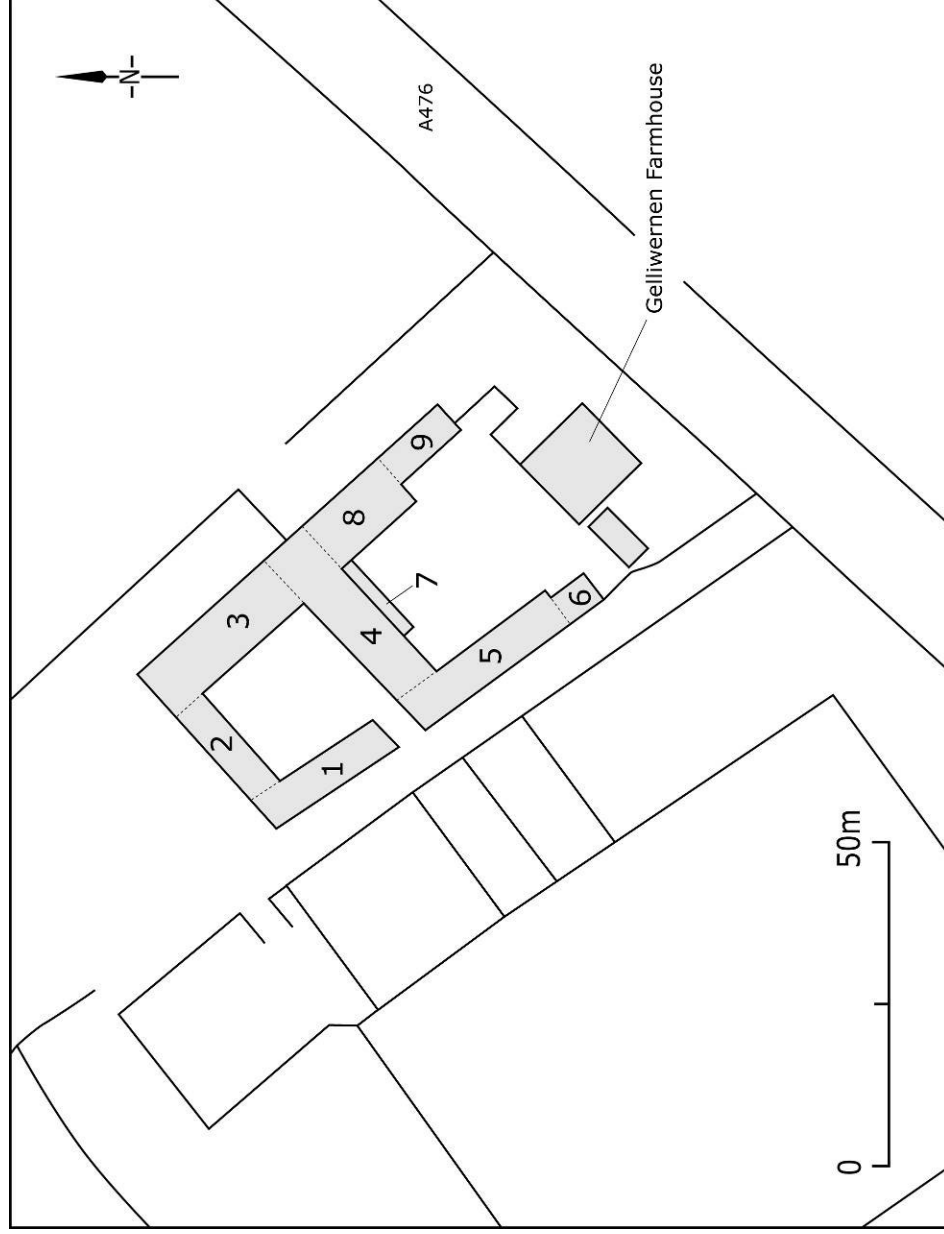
Plan of Gelliwernen showing building locations with numbers referred to in text.
